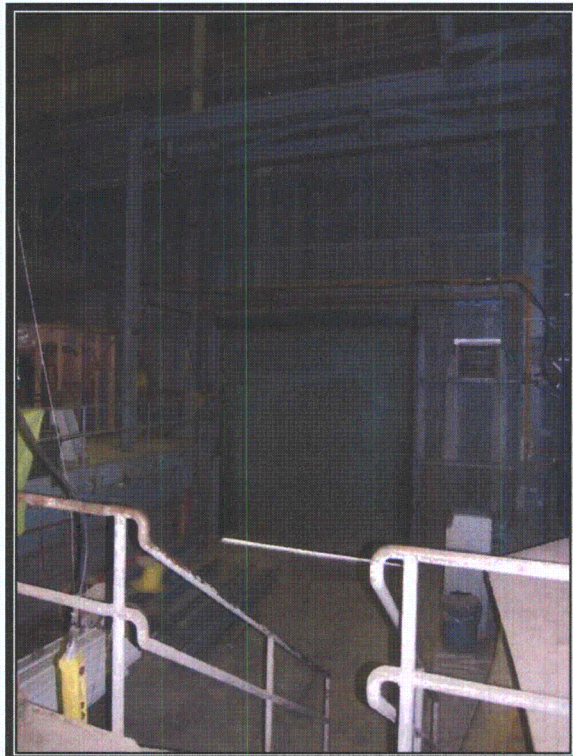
Overhead door in east wall of steam generator building (Photograph by RCG&A, 2008)
